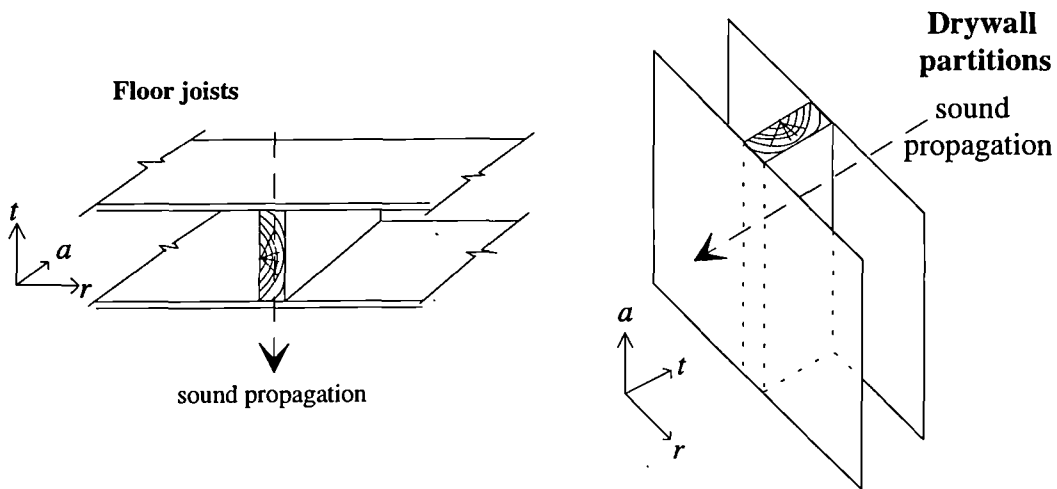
Direction of loading and sound propagation for floor joists and drywall partitions.
